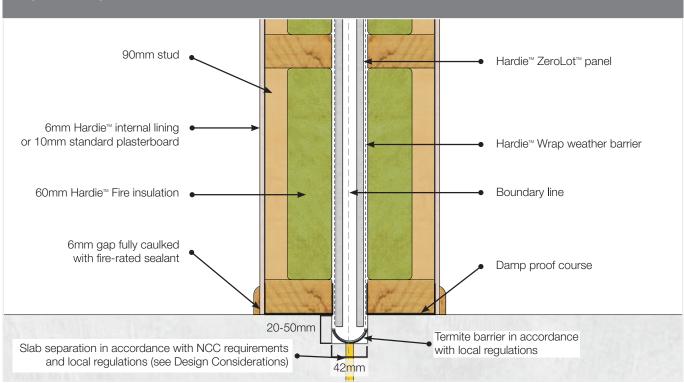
SLAB DETAIL FOR DUAL BOUNDARY SYSTEM
